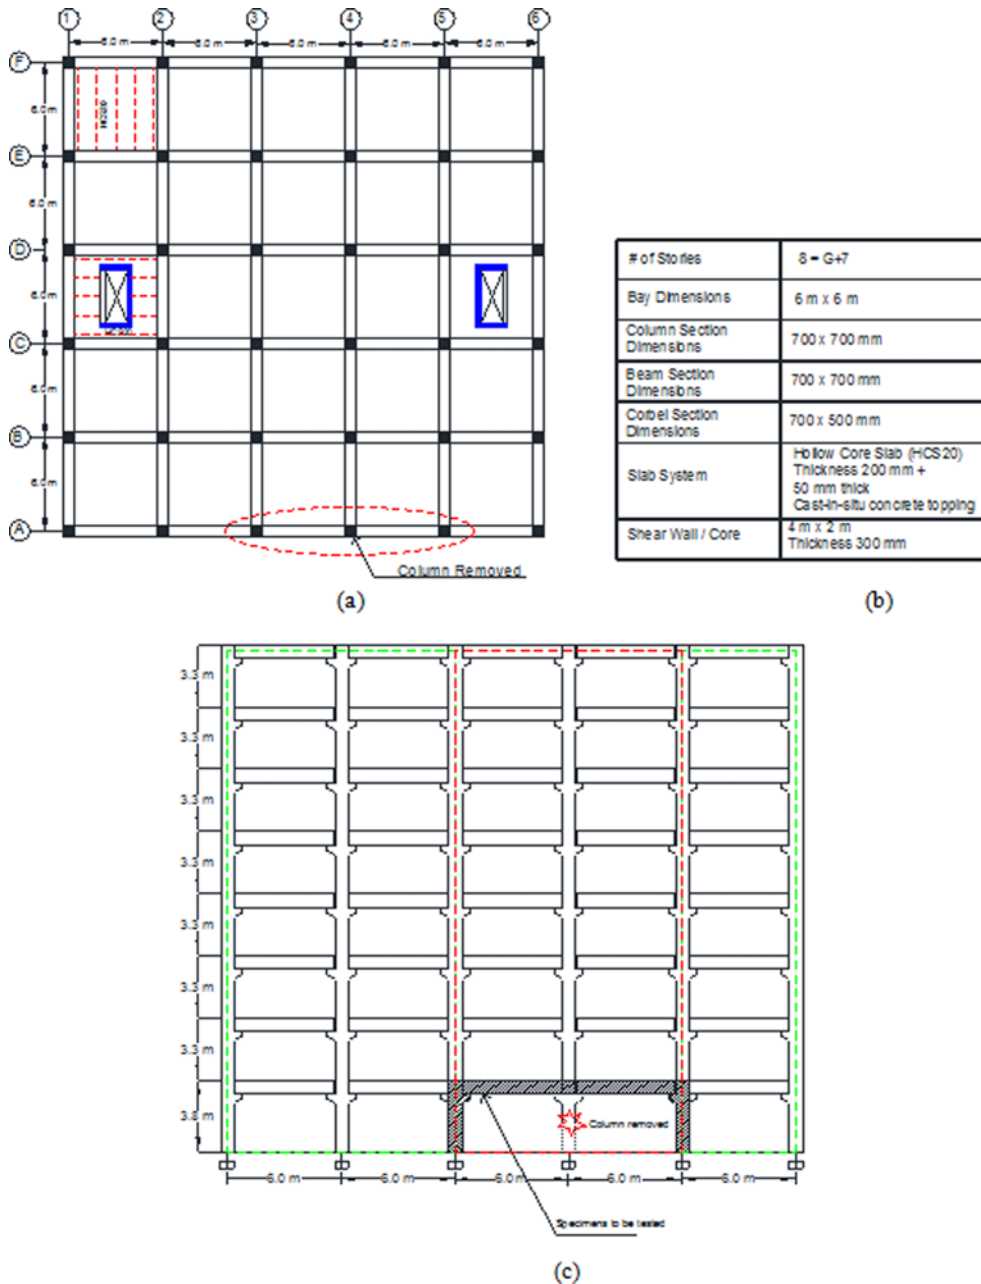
Location of the Prototype of Test Specimens: (a) Plan View of Prototype Building, (b) Structural Details, (c) Elevation View of the Prototype Building
